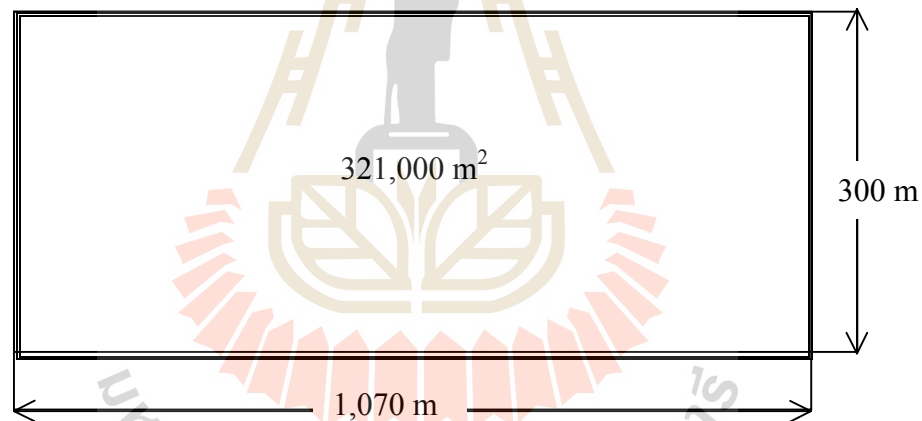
Schematic layouts of the convention landfill trench method (top view).
